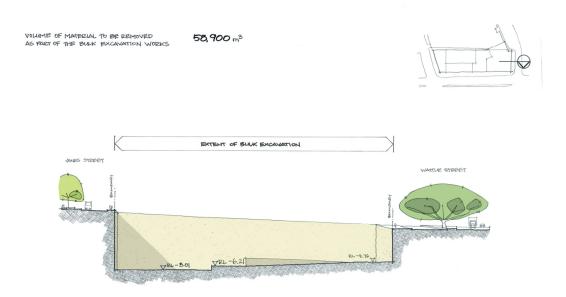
Section of bulk excavation at Building 10 (Source: DCM)
